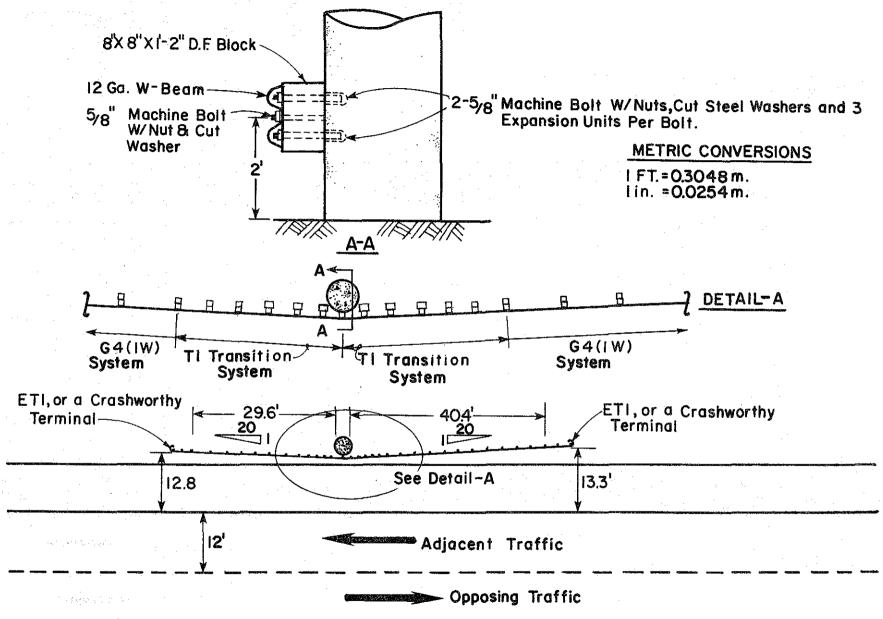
Suggested Design and Layout for Example Problem
